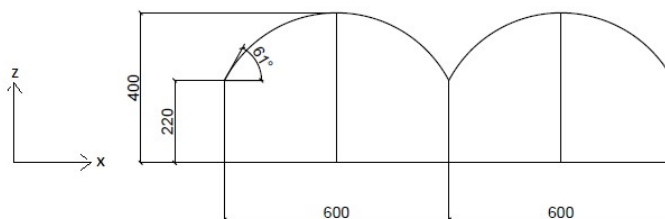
Section drawing of multi-span roof with cylindrical shape with dimensions [cm].
